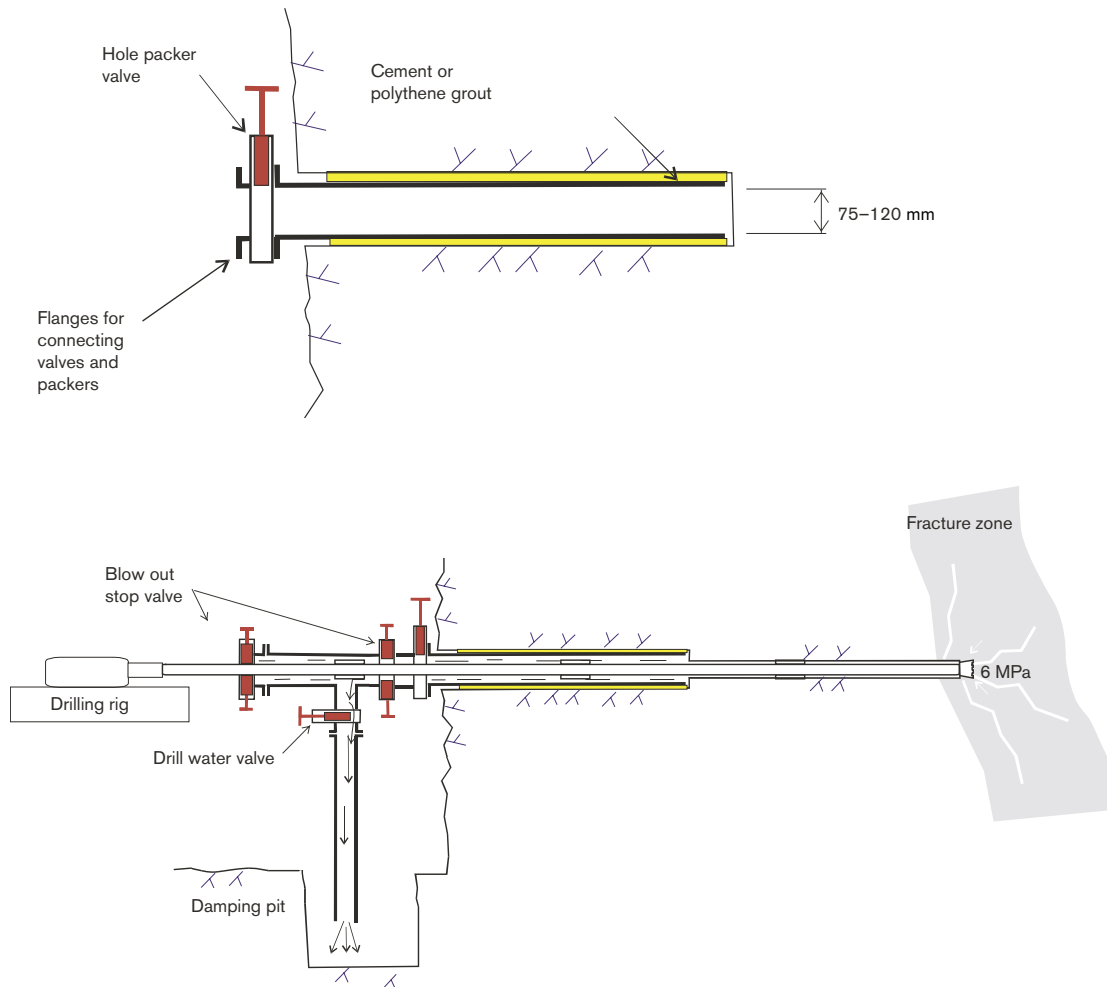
Sketch illustrating a “blow-out-preventer” system.
